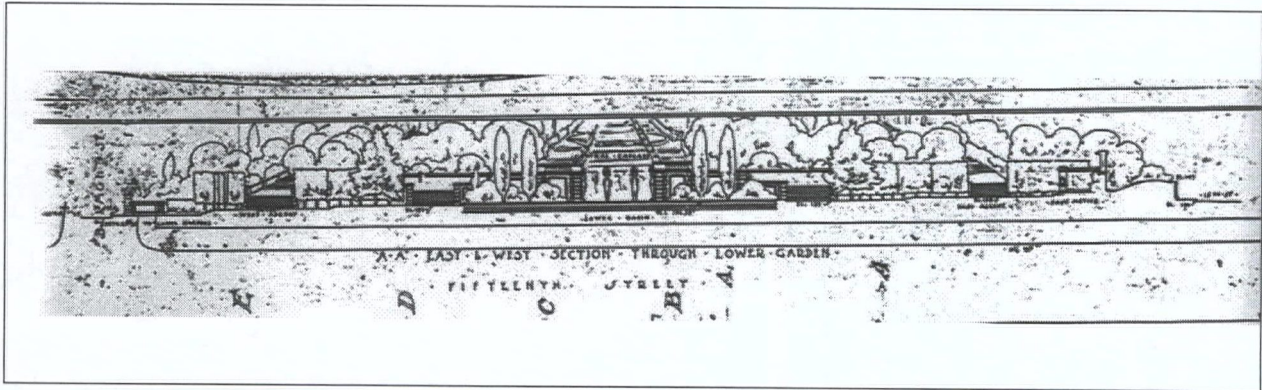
Cross-sectional sketch from 1918 plan of the Lower Gardens looking north from the lower plaza to illustrate the planting concept (National Archives RG 79, 41-3).
